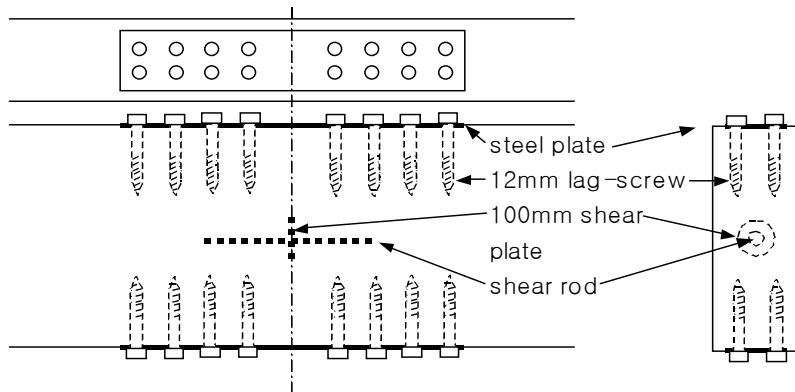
Lag-screwed joint with top and bottom steel plate (SCP-type connector).
